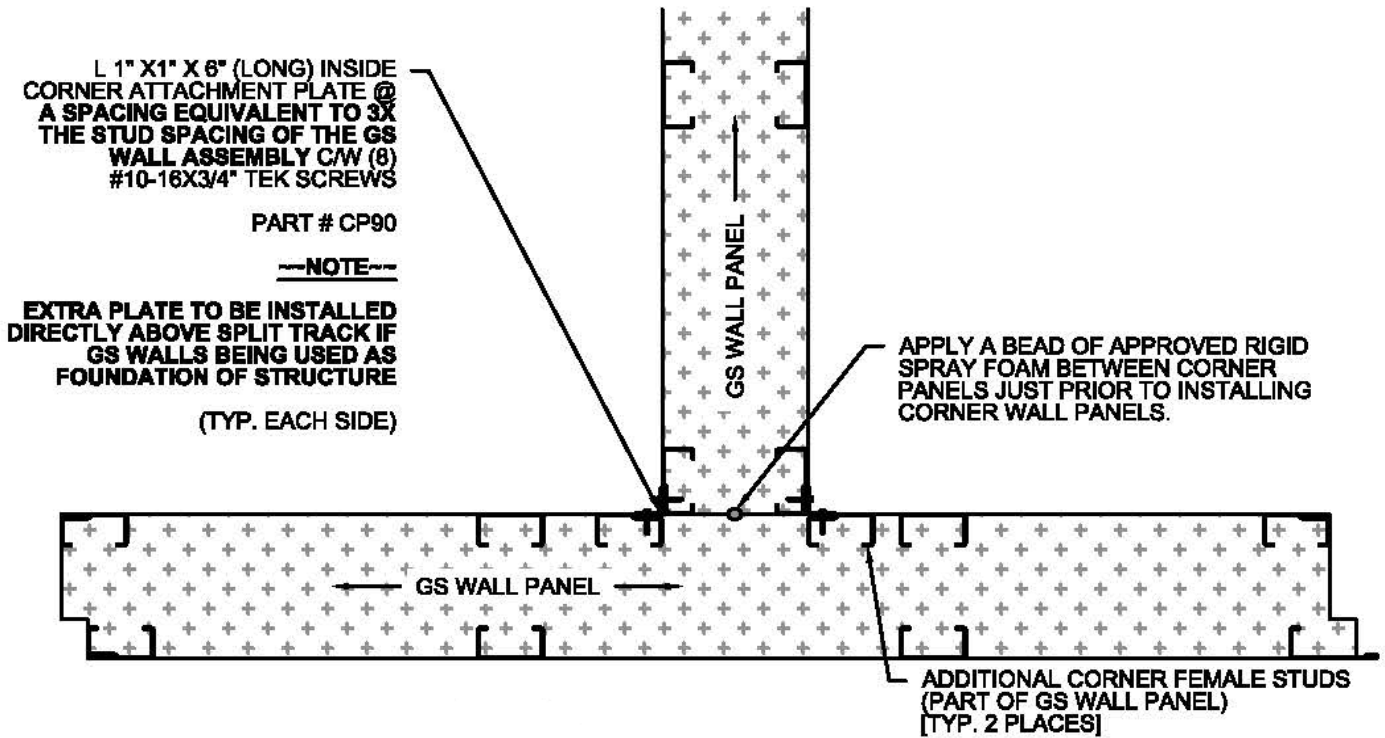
Greenstone ICE Panel Intersection Connection Detail
